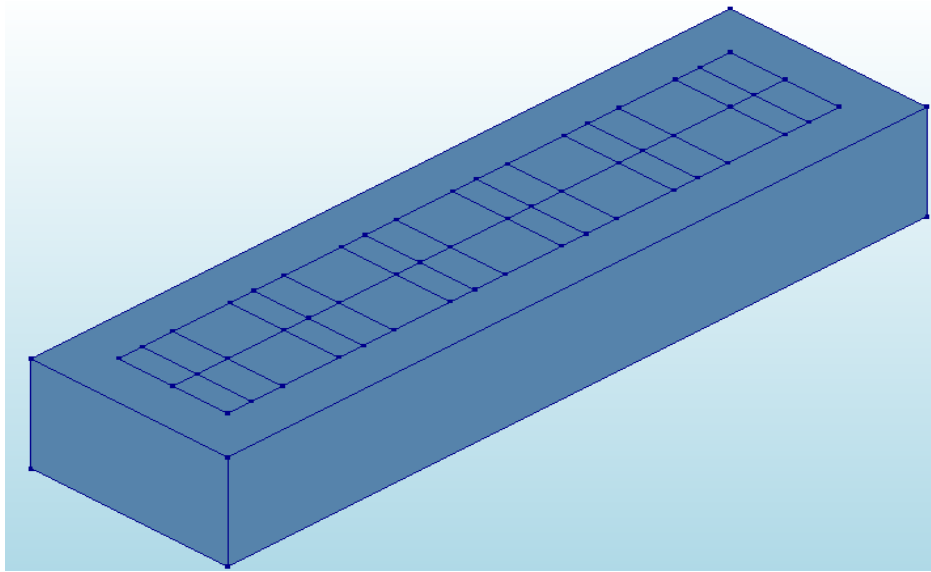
Detail of the imprint between the lowest row of bricks and the concrete foundation
